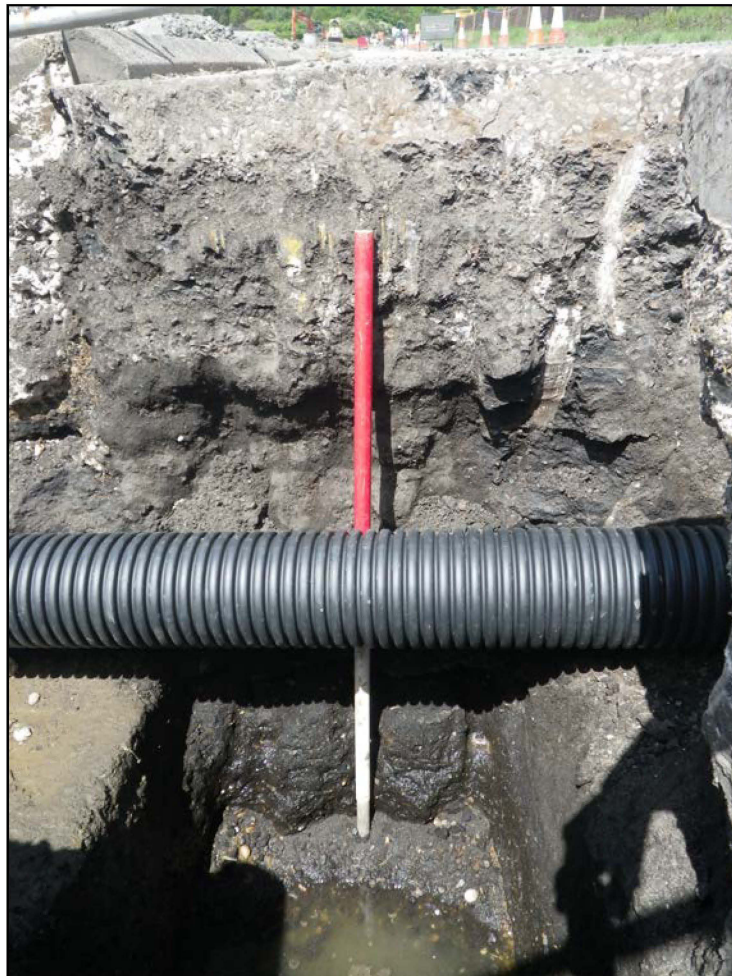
view of drainage trench across existing road, camera facing north (ref. HWS 47)
